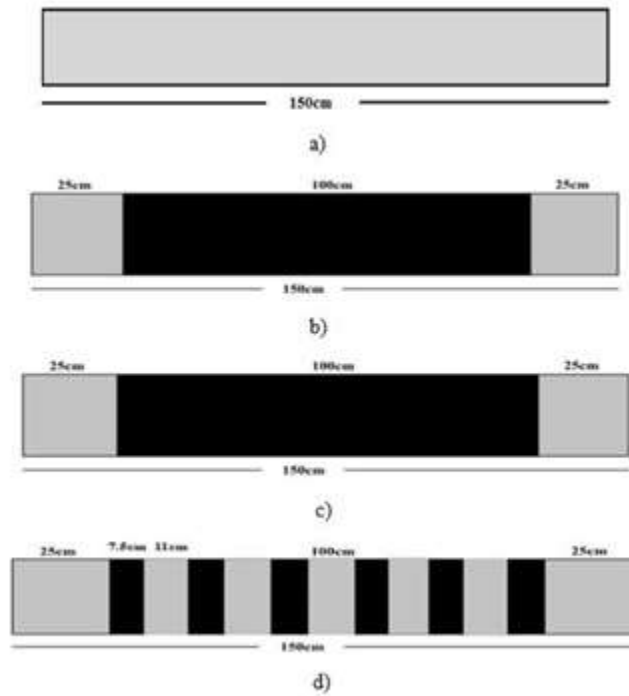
Geometry and reinforcement arrangement of the tested beam: (a) control beam, (b) complete wrap, (c) U-wrap, and (d) wrapping with strips²⁶
